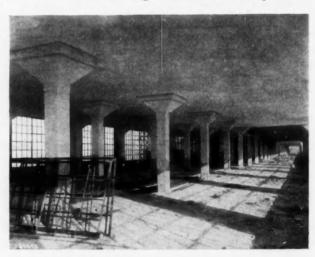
Flat Slab Building. No Spandrel Beams. Windows Carried Up to Celling Level. Note Excellent Lighting Effect.
